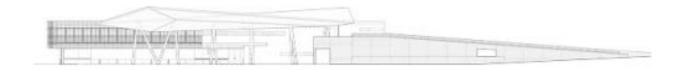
Building Elevation Illustrating Partially Underground Auditorium – Queens Botanical Garden Visitor Center
